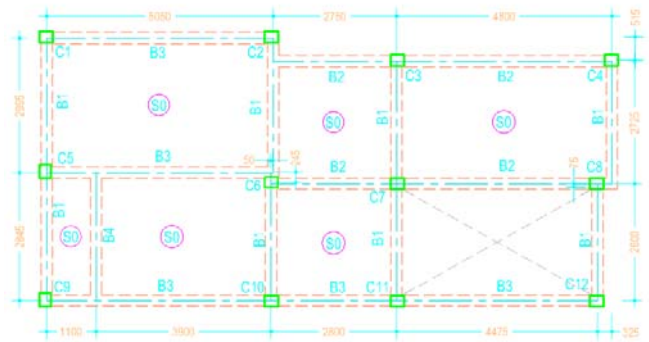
Floor Beam, Slab, Column Layout Plan indicating column number
